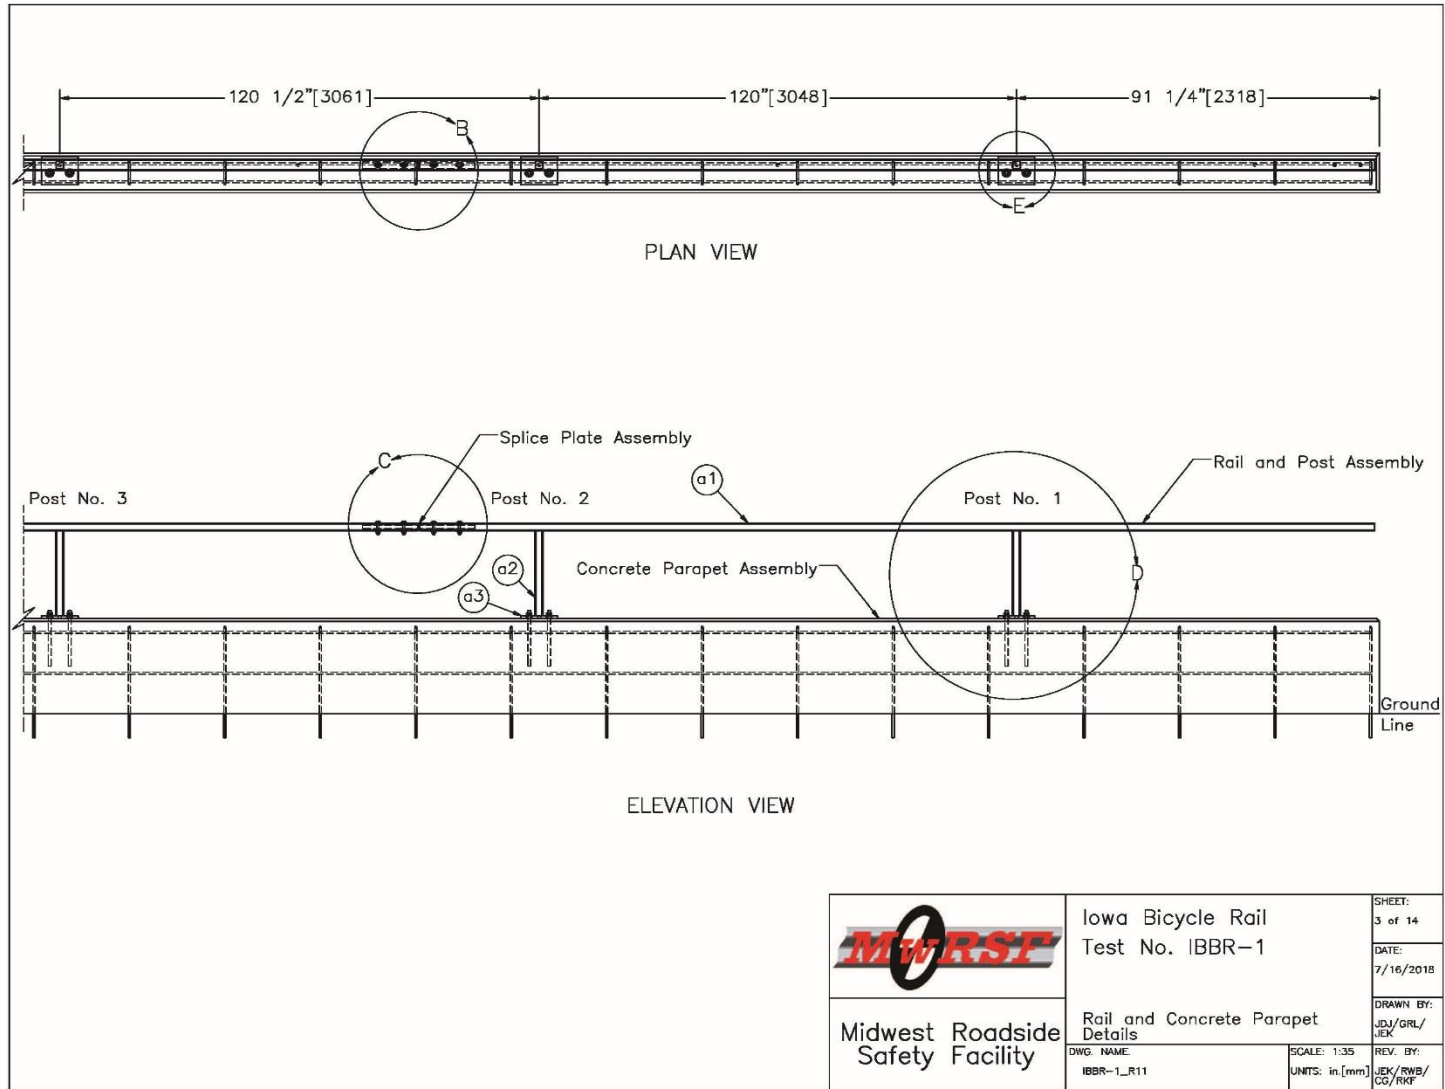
Iowa Bicycle Rail – Rail and Concrete Parapet Details
